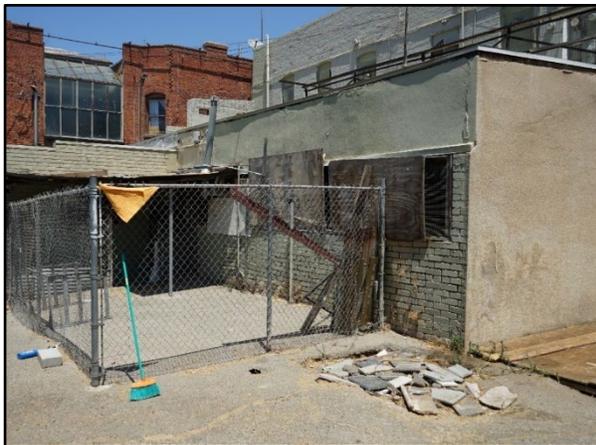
Closeup of one-story additions at center of the rear elevation, facing north.
